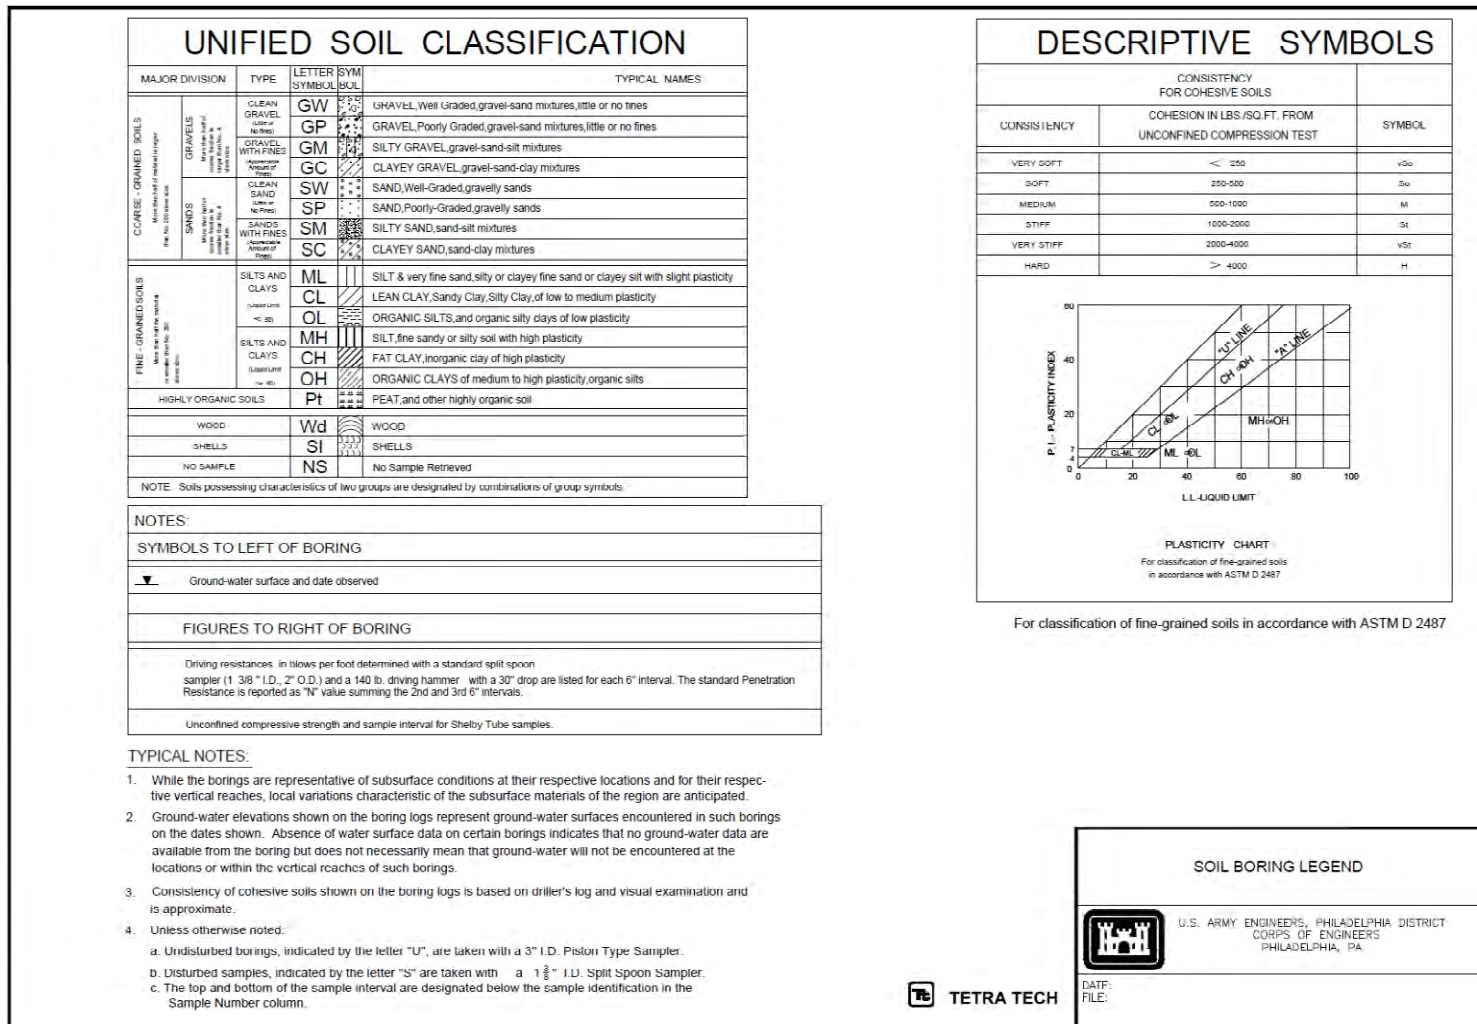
con't: Geotechnical Subsurface Exploration, Lambertville, New Jersey – Test Boring Logs
